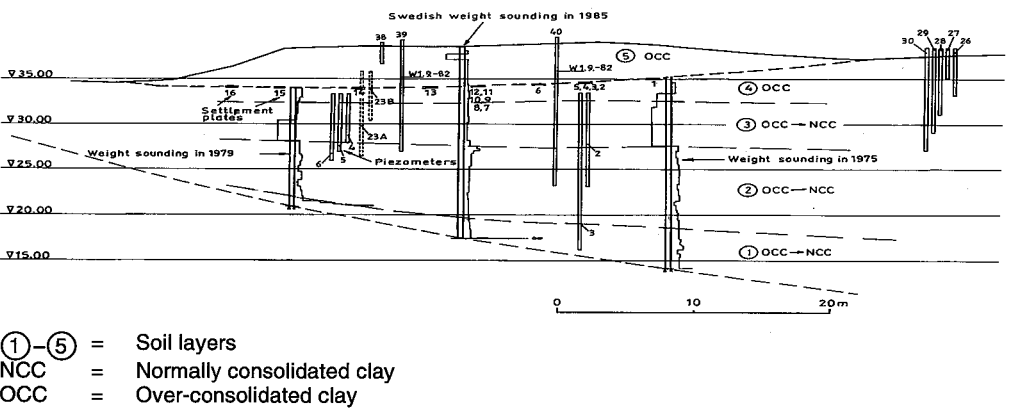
Longitudinal section K-K of Taasia test embankment (Fig. 8).
